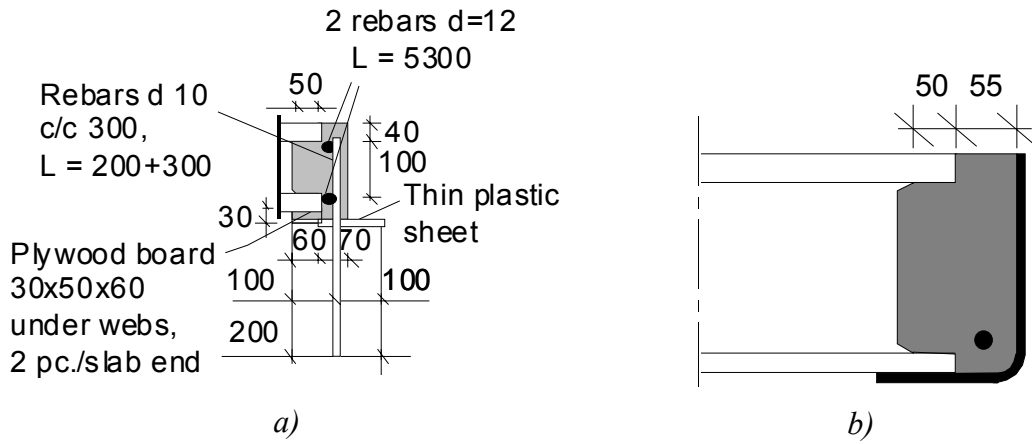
Arrangements at supports of floor. a) Arrangements at supporting beam, section K-K in Fig. 10. b) Arrangements at trimmer beam, section L-L in Fig. 10.
